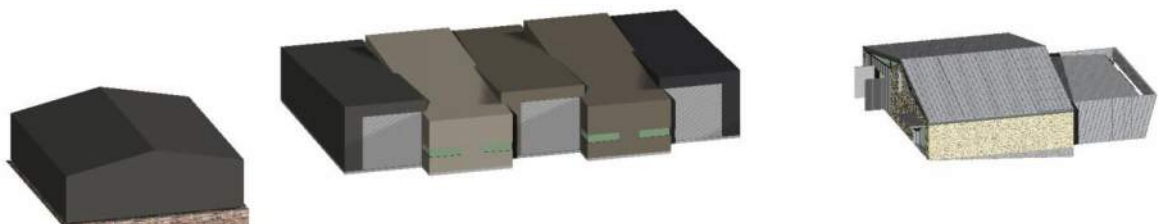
Proposed development: the proposed shed of 30m x 17m (510m²), expressed as 5 modules alternating front to back, provides for greater separation from the farm building and stone barn creating a less crowded feel with the same size of building, and maintaining a sense of open space in the Depot.
